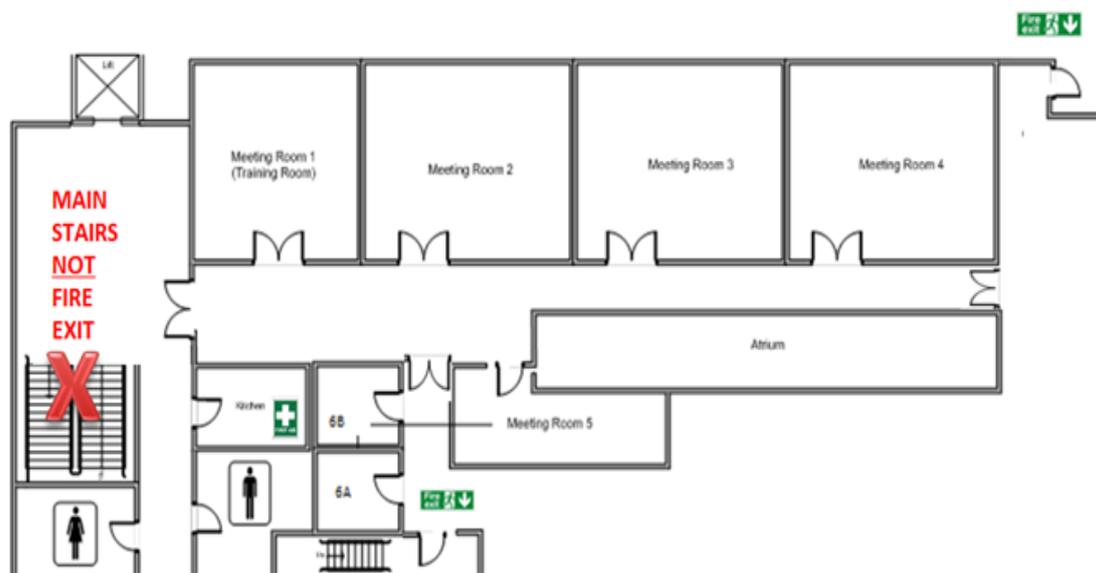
Level Two Floor Plan – 160 Bealey Ave
